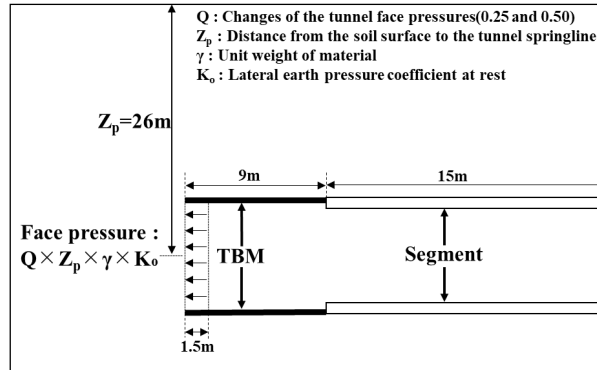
Modelling of shield TBM tunnelling and application of tunnel face pressure
